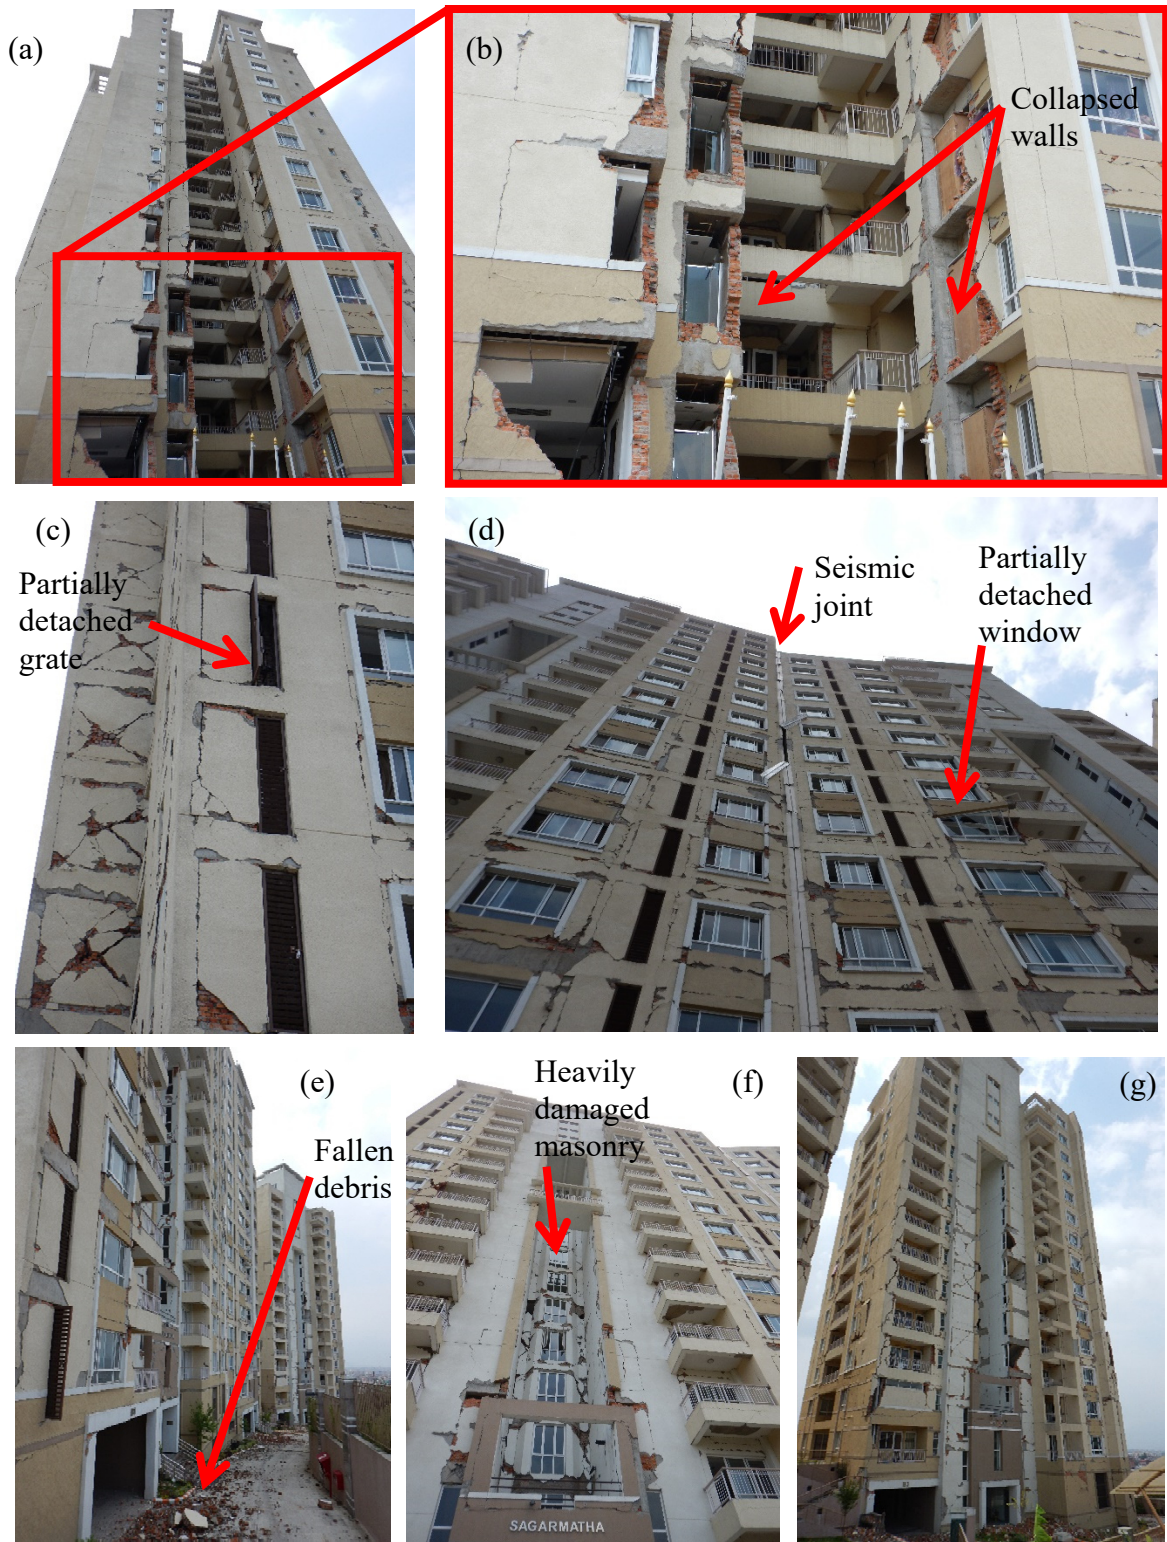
Parkview Horizon (Dhapasi) – heavy non-structural damage: (a) overall view Sagarmatha building east side; (b) close-up view Sagarmatha building east side; (c) northeast corner Sagarmatha building; (d) seismic joint between Sagarmatha and Kanchanjunga buildings; (e) looking along north side of complex; (f) north side of Sagarmatha building; (g) north side of Makalu building.
